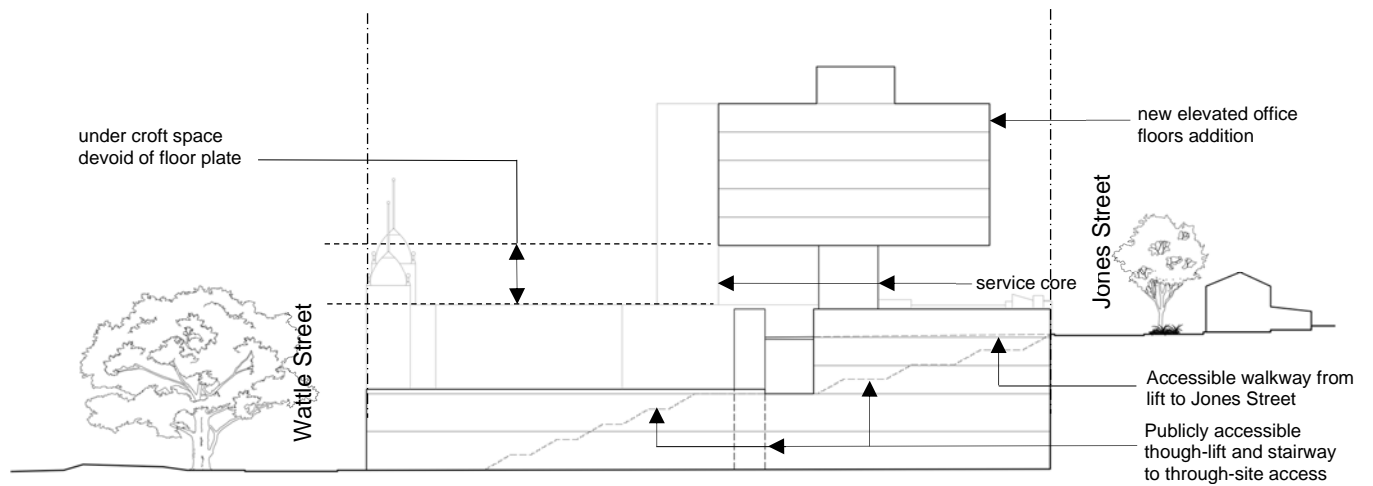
cross section of modified scheme for 28-48 Wattle Street
